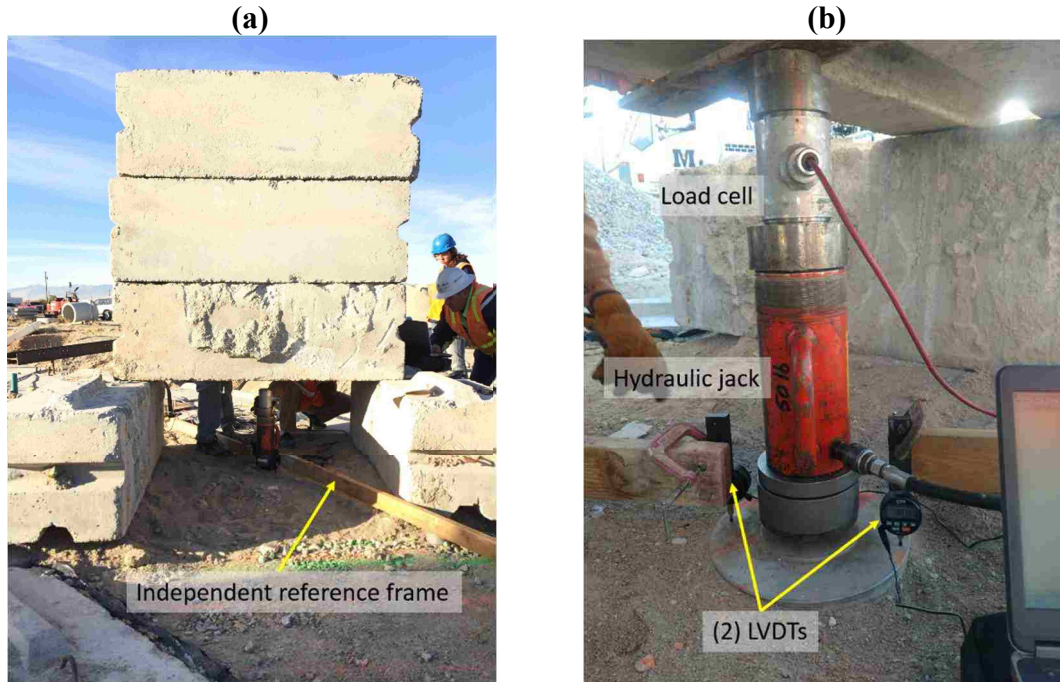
Plate load test setup showing (a) reference frame and reaction load, and (b) hydraulic jack, load cell, and LVDTs.
